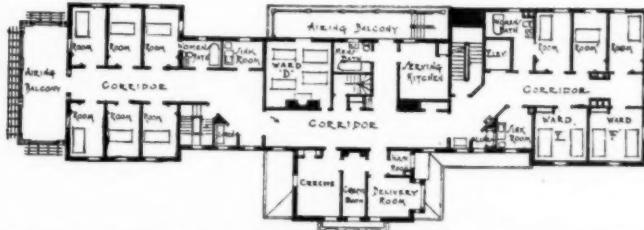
Second floor of the Choate Hospital. The former operating room (in the center) has been connected into a delivery room.
